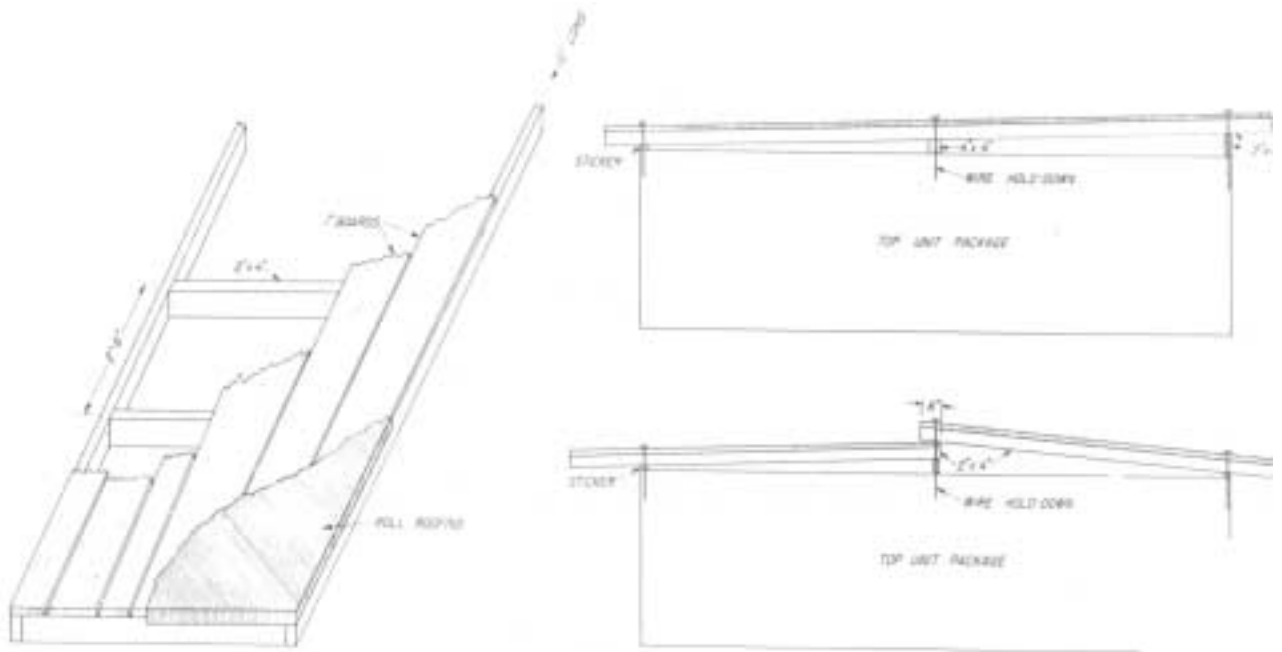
Pile roof constructed of 2x4s, boards, and roofing paper.
